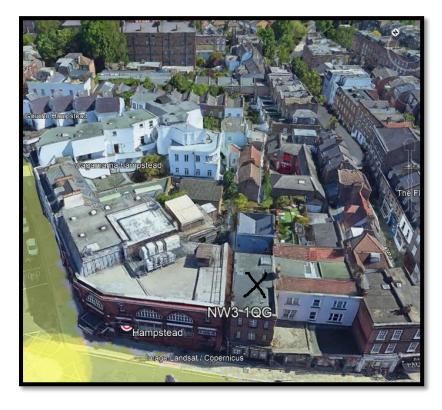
Aerial showing gap at the rear of the site between the application site and adjoining buildings. Note the narrow access down the side of the property adjacent to the Tube Station and the site at rear constrained and surrounded by blank facades of the adjoining buildings.
